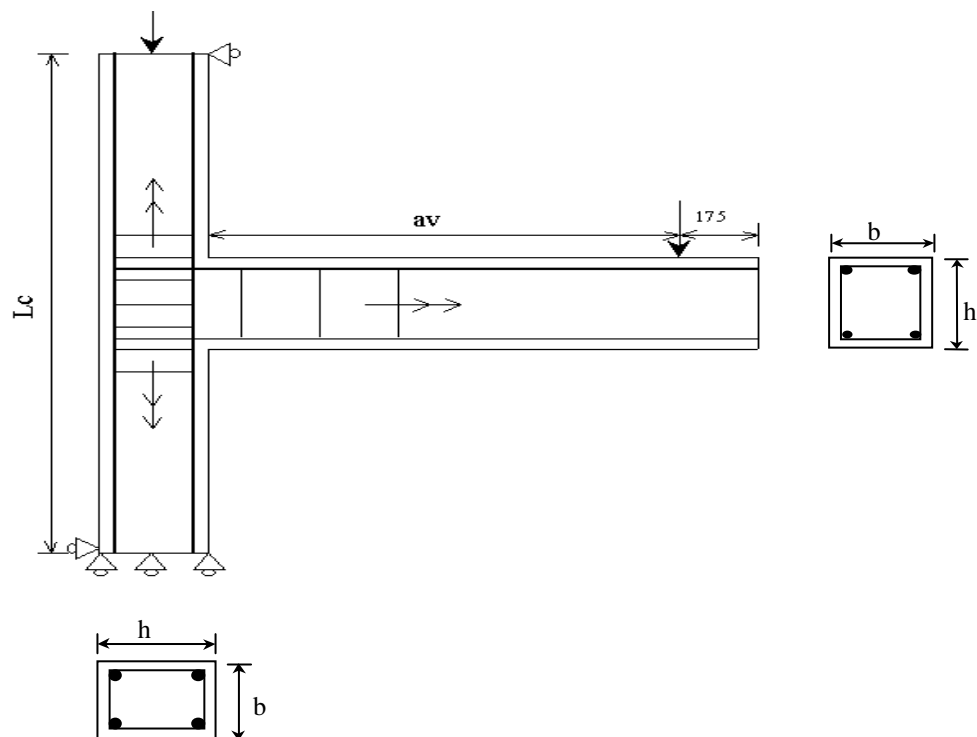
Experimental corner beam-column joint specimen (Sarsam (1983))
